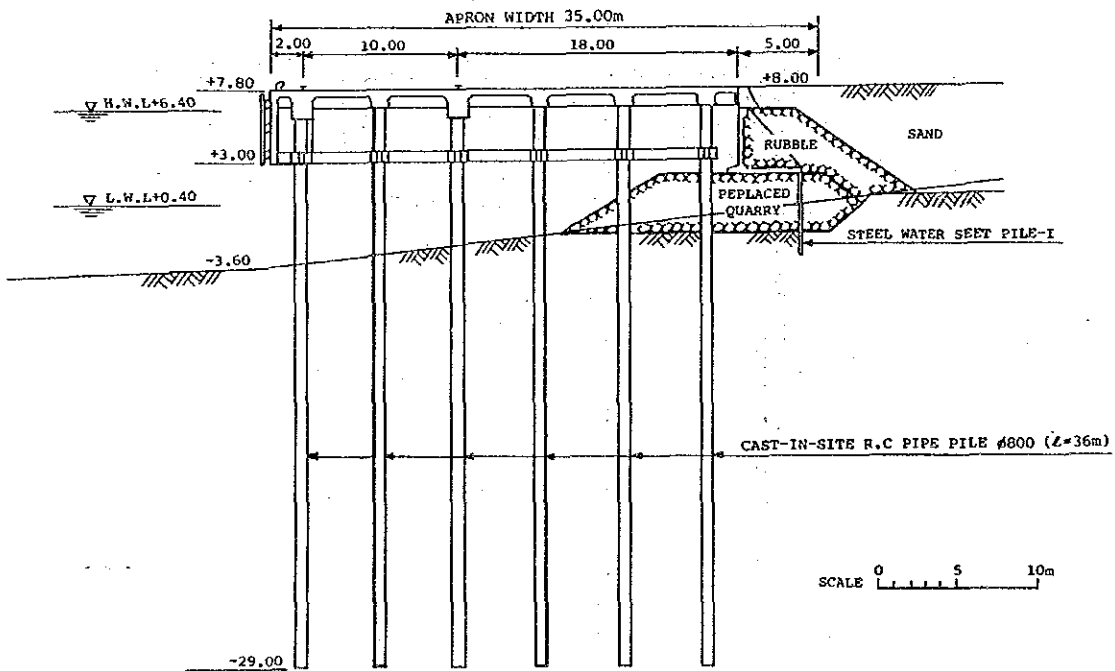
CAST-IN-SITE R.C PIPE PILE
